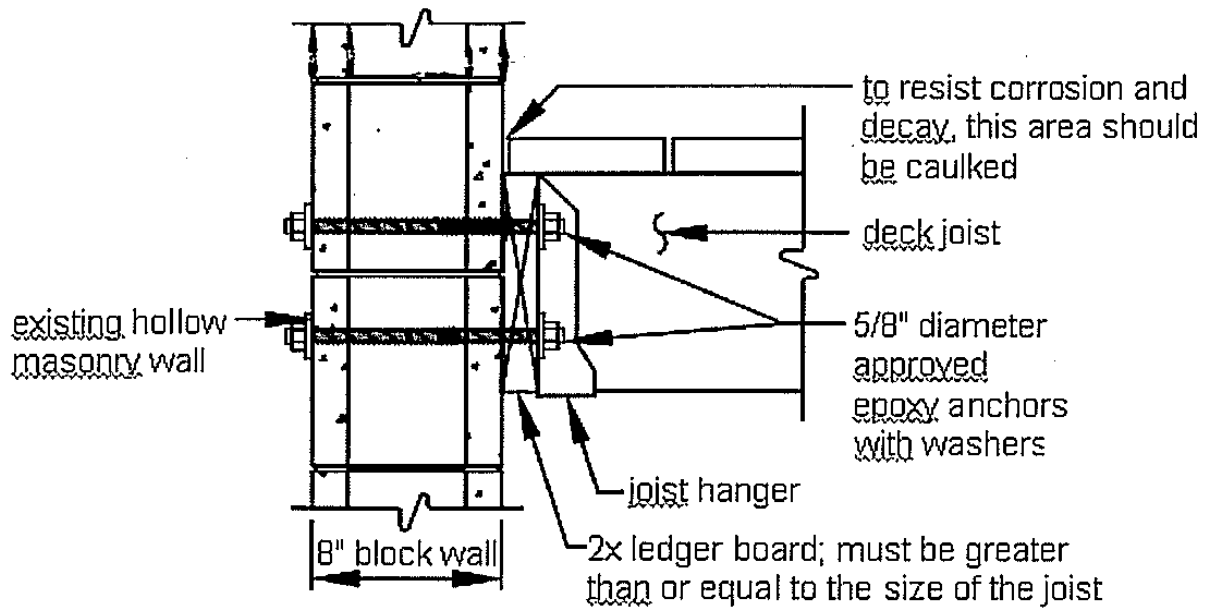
ATTACHMENT OF LEDGER BOARD-TO-FOUNDATION WALL (HOLLOW MASONRY)
